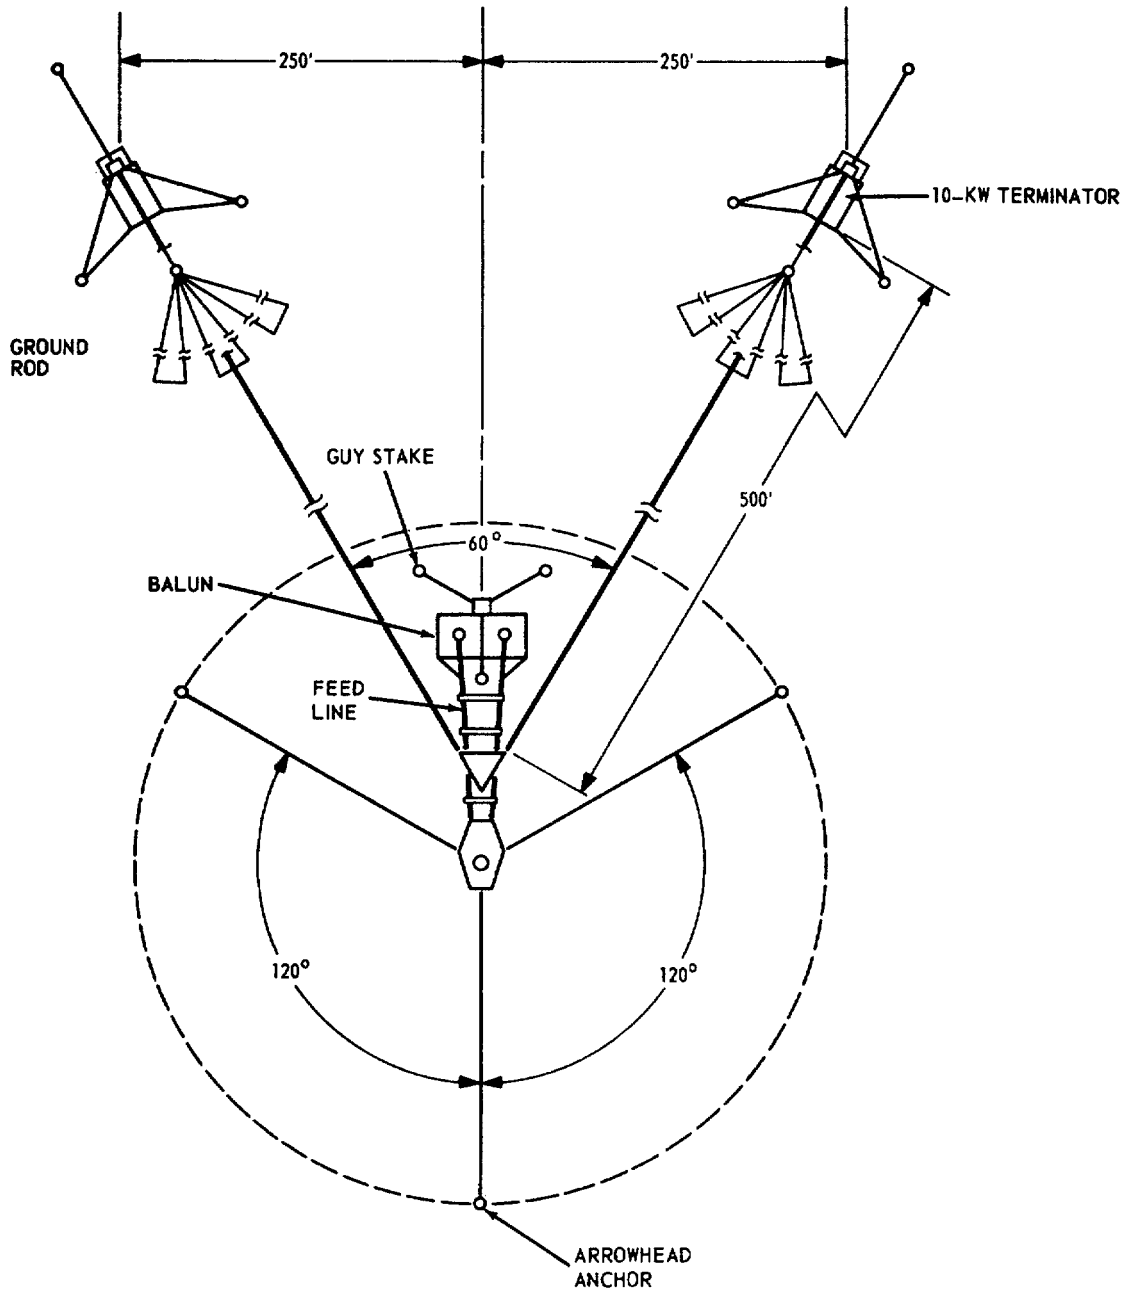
10-kw sloping vee antenna installation, plan view.
